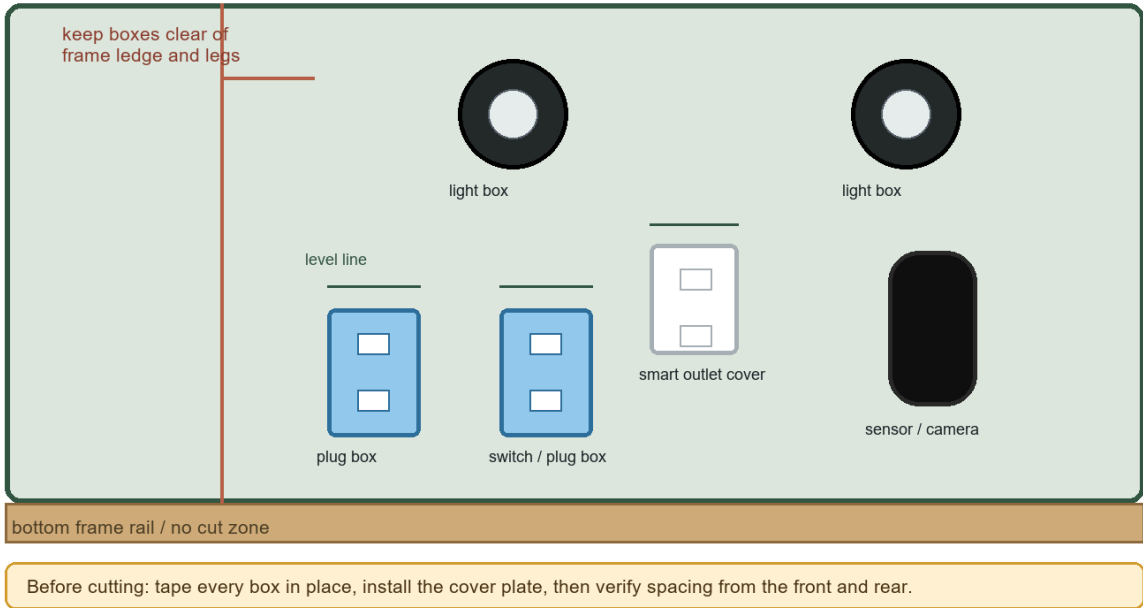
Example front layout: tape boxes in place first, then check level, spacing, and back-side clearance before cutting.
